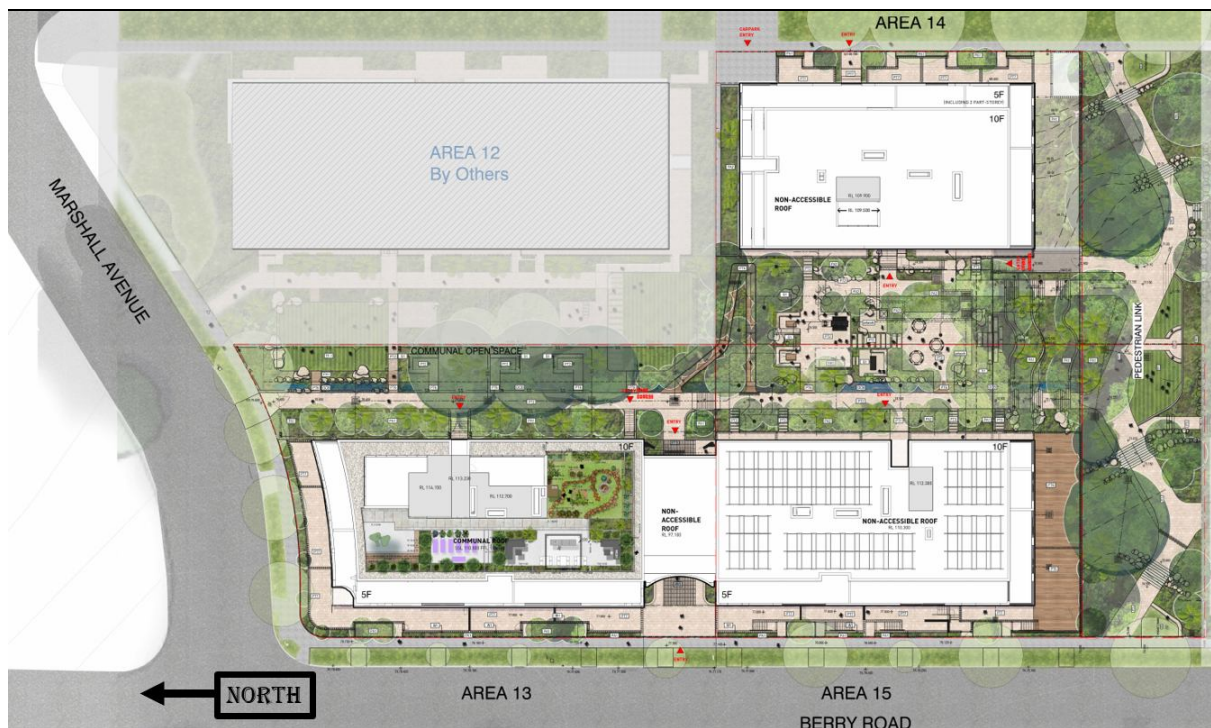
Proposed Site and Roof Plan. (Source: PTW).
